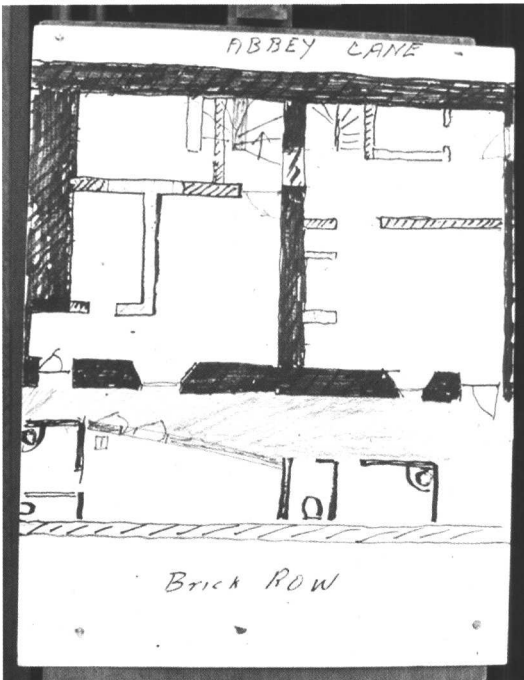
Mr Baskerville's ground floor plan of 8 and 9 Abbey Lane during renovation.
